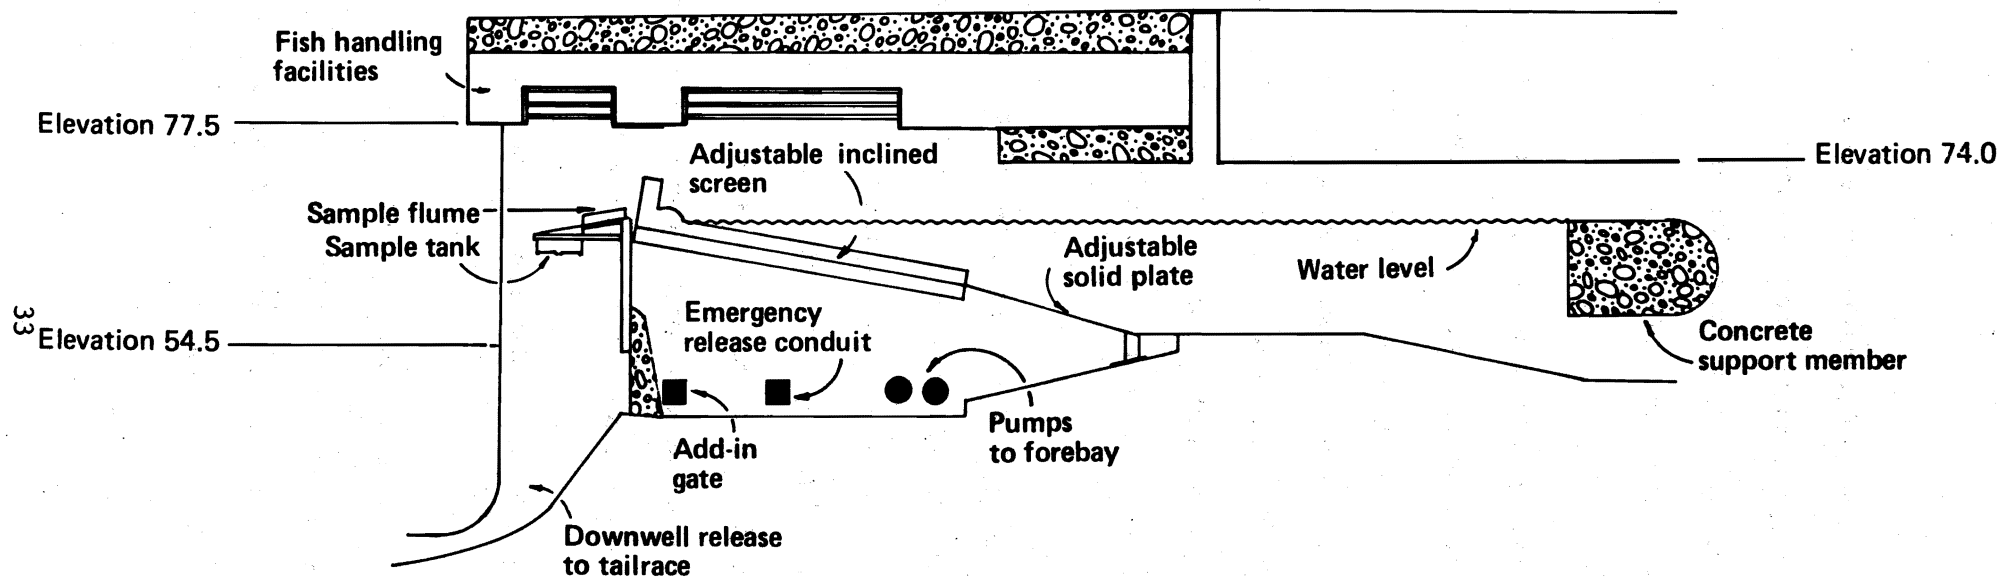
Cross-section of the juvenile bypass (downstream end) system at Bonneville Dam First Powerhouse, 1984.
